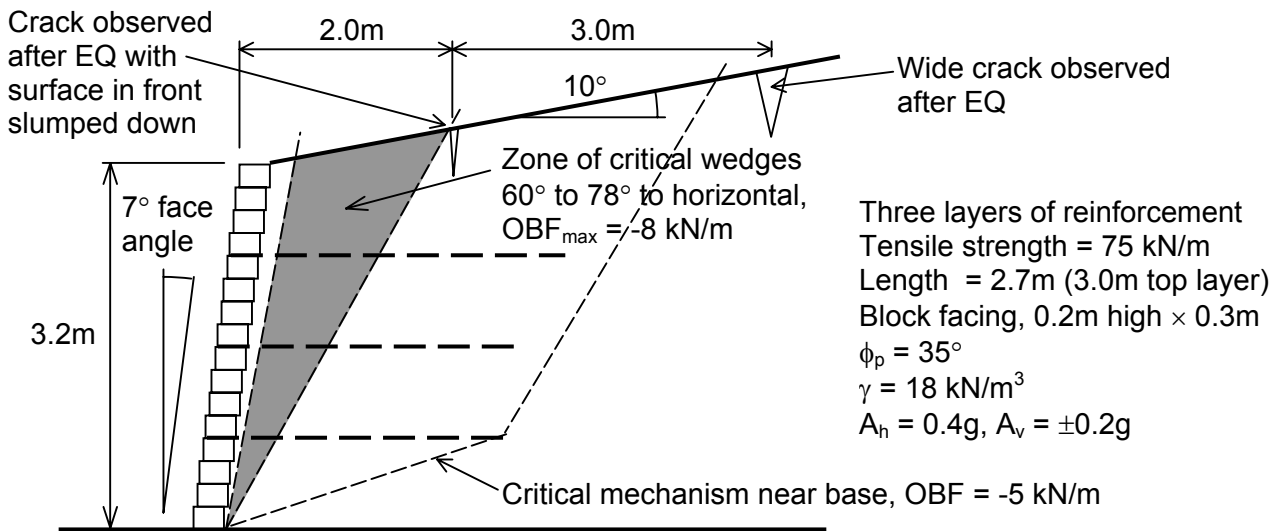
Modular block wall at Site 1 which failed during Chi Chi earthquake
